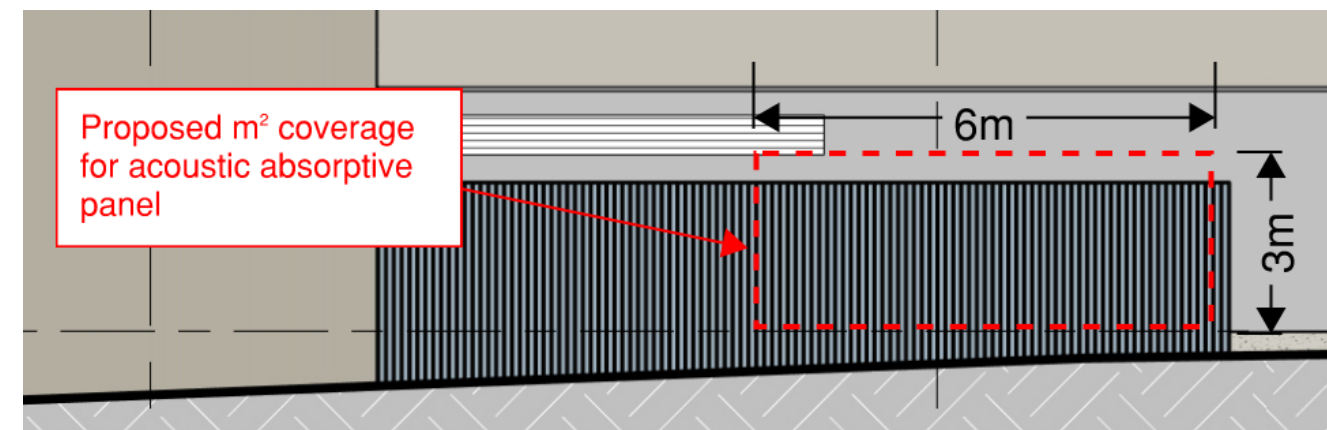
Proposed m² coverage of wall-mounted acoustic absorptive panels for mechanical plant enclosure
